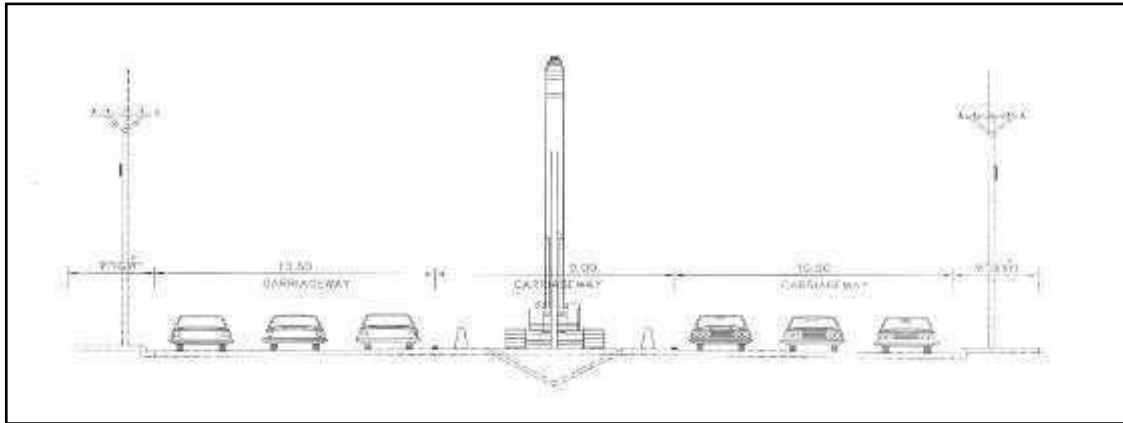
7 The pattern of traffic management during the construction on Srinagarindra Road from the Phatthanakan Intersection to the Si Thepha Intersection (sub-urban road)
